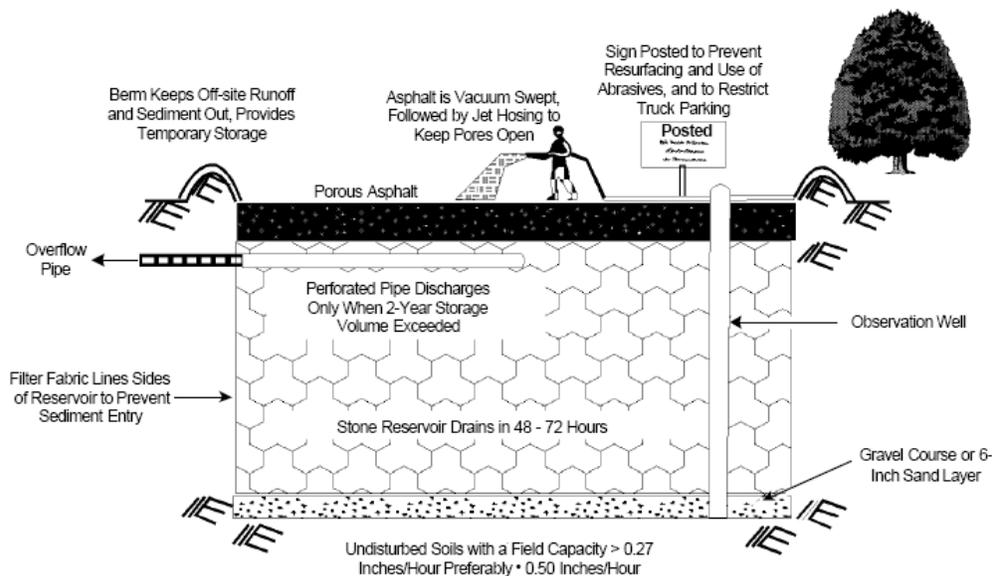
Model of a Permeable Pavement System. (Source: <http://www.epa.gov/owm/mtb/porouspa.pdf>)
